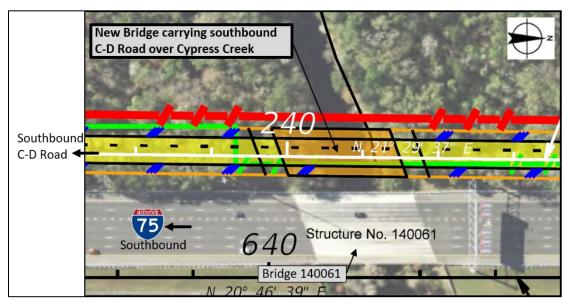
New Bridge-Southbound C-D Road over Cypress Creek
